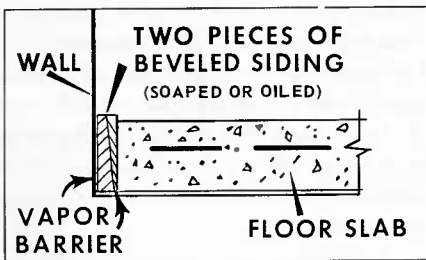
The 1-inch joint between the basement walls and floor is formed with pieces of siding. After the floor slab has cured, the pieces of siding are removed, and the joint is filled with hot coal-tar pitch.
